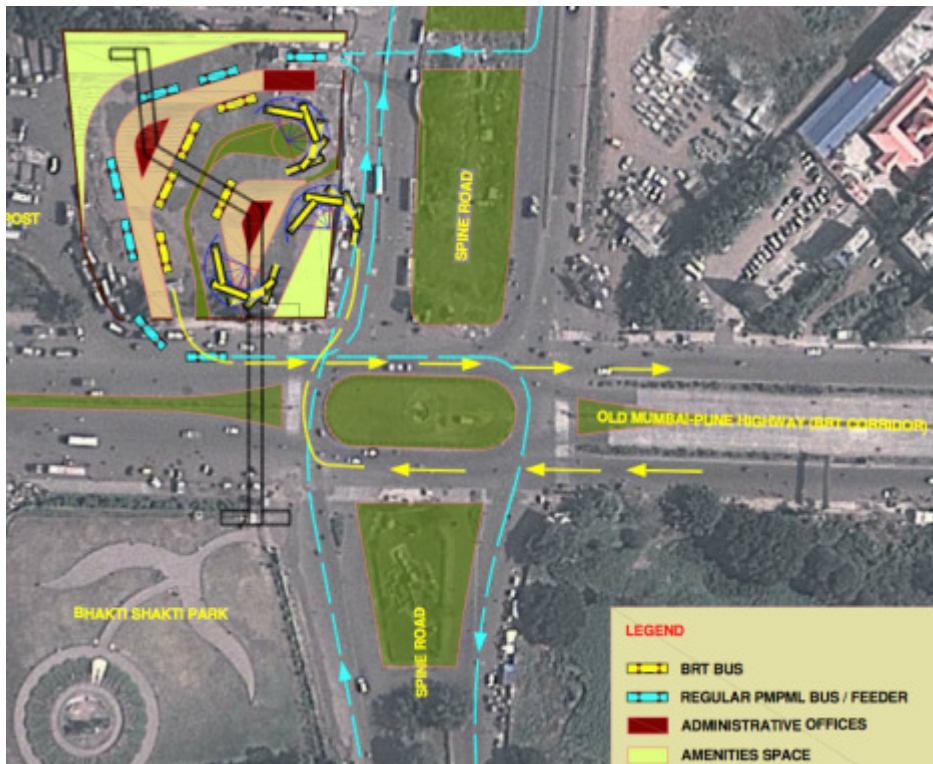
Conceptual design for a trunk-feeder transfer facility in Pimpri-Chinchwad
